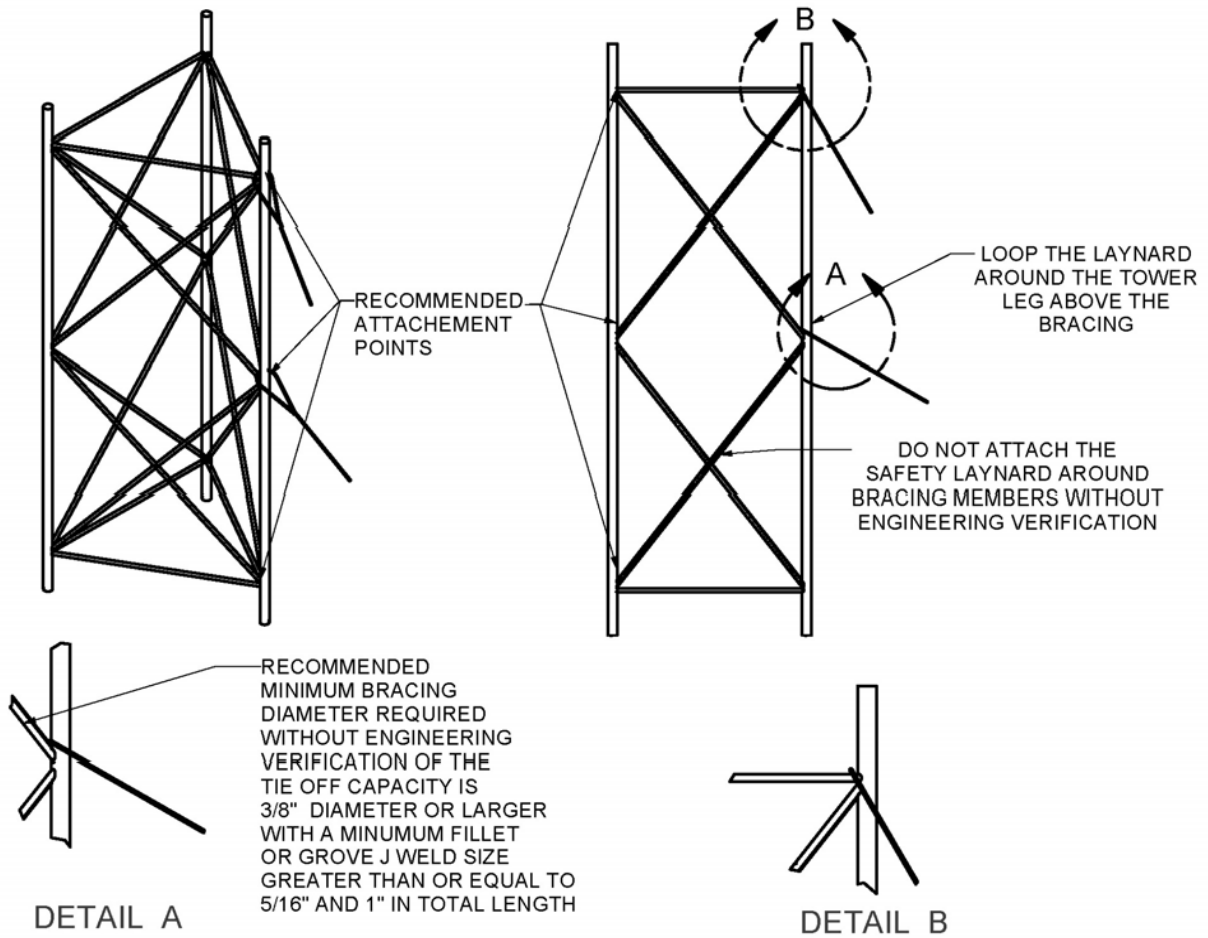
Examples of Climber Attachment Anchorages (All welded Sections)
